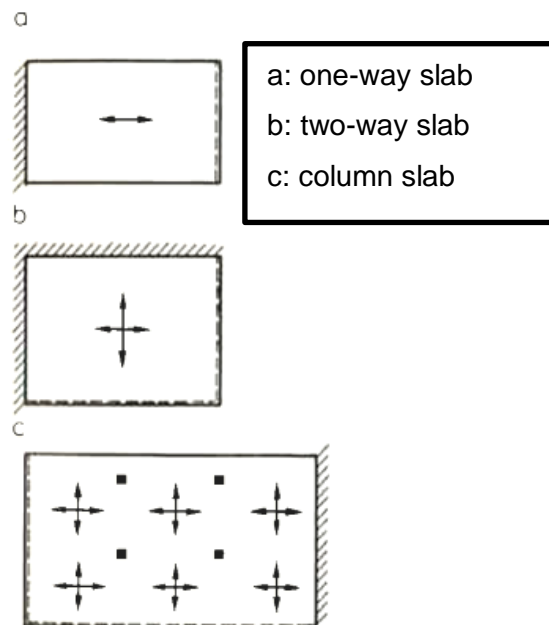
Different concrete slab types. Modified from RIL 125 (1986) [9,293] .
